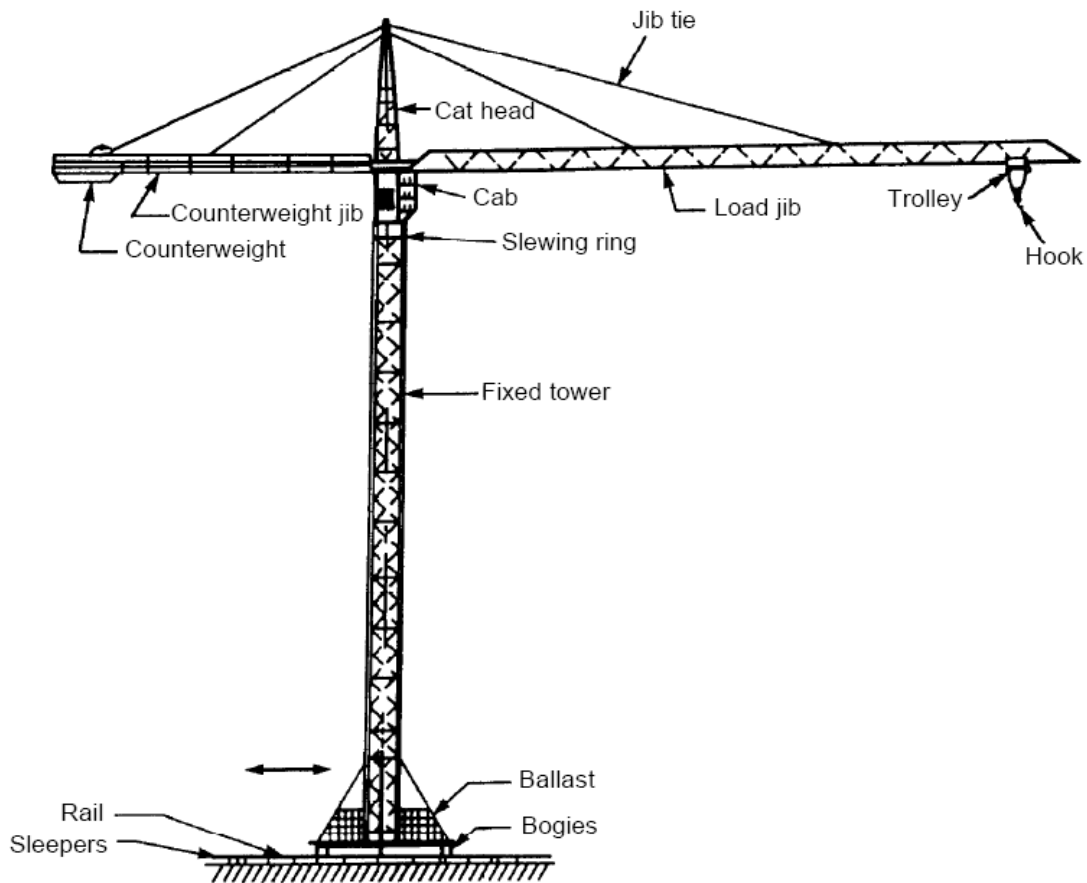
Tower Crane Schematic (source: Material handing handbook)
